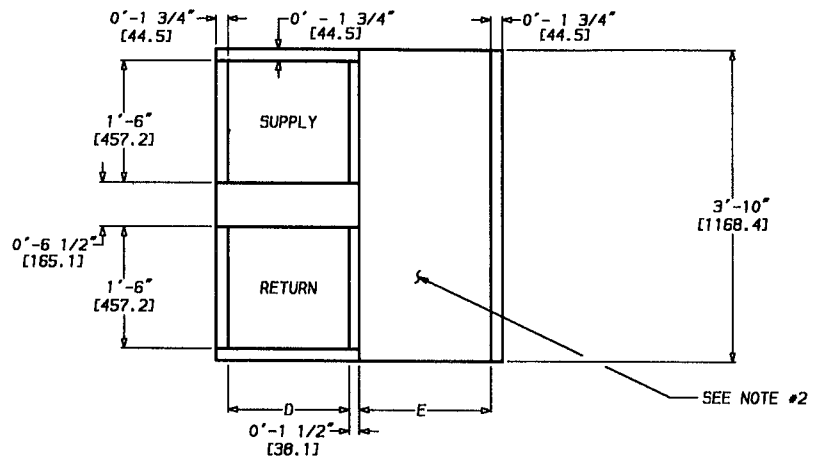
584B Large-Cabinet Unit Dimensions
